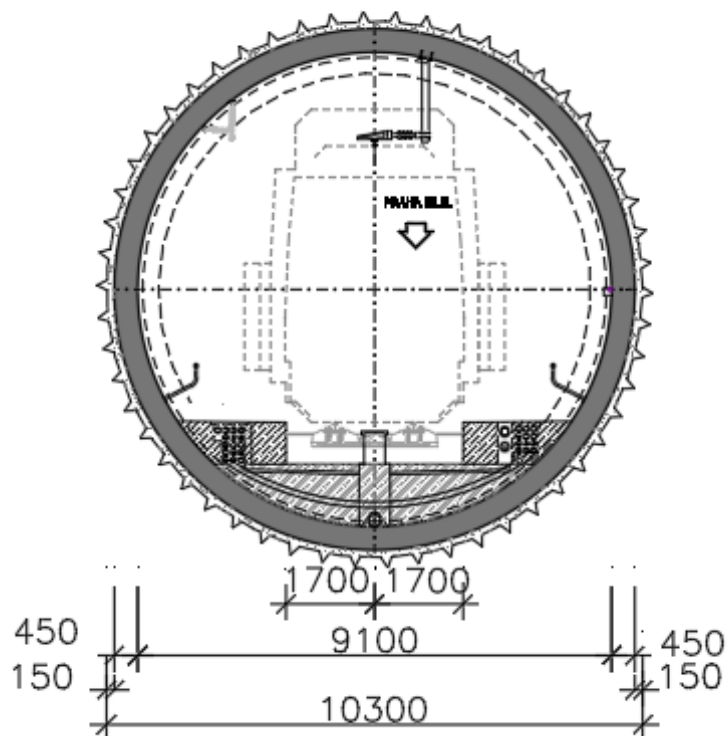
Cross-section of the excavated part of the Střížkov Tunnel
